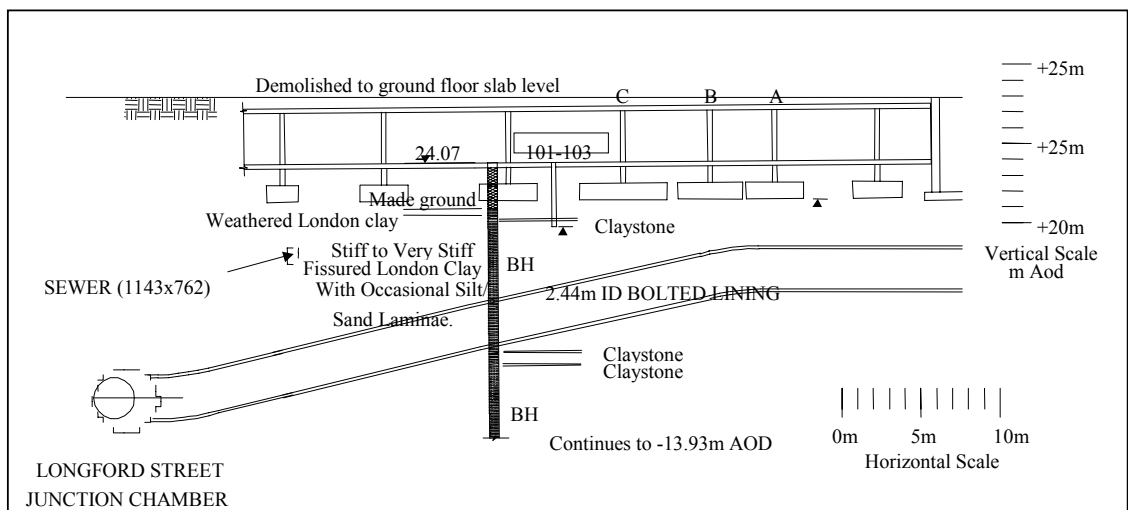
Section through spur tunnel and basement structure at Longford Street
